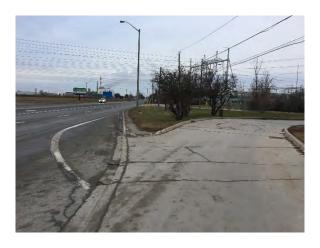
Bramalea Road Southeast of Highway 407, facing northwest
